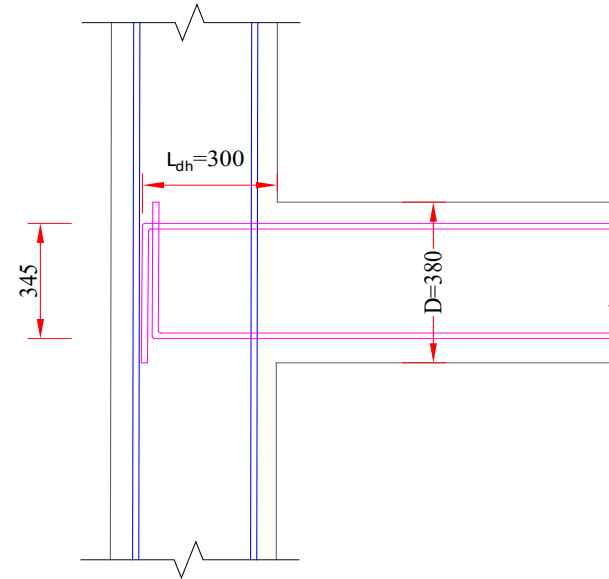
ANCHORAGE OF LONGITUDINAL BARS OF BEAM IN COLUMN
